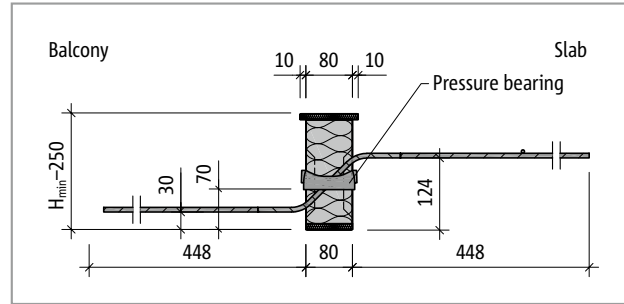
Schöck Isokorb® T type Q-V6: Product section
